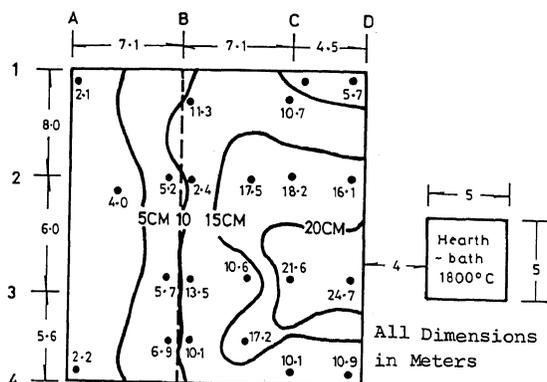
Contours of Heave of Ground Floor (February, 1977)
